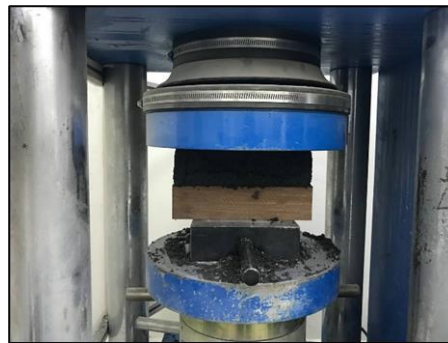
An interlocking brick sample being tested in the compression test machine
